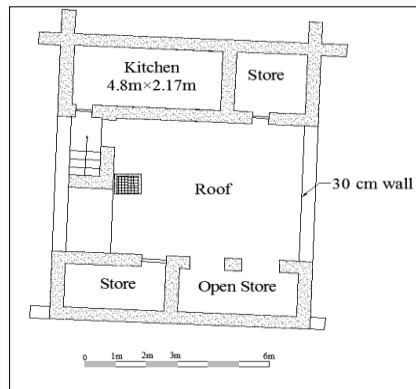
Roof plan with the kitchen and stores in Abdulsalam Ali house in Ghadames.
